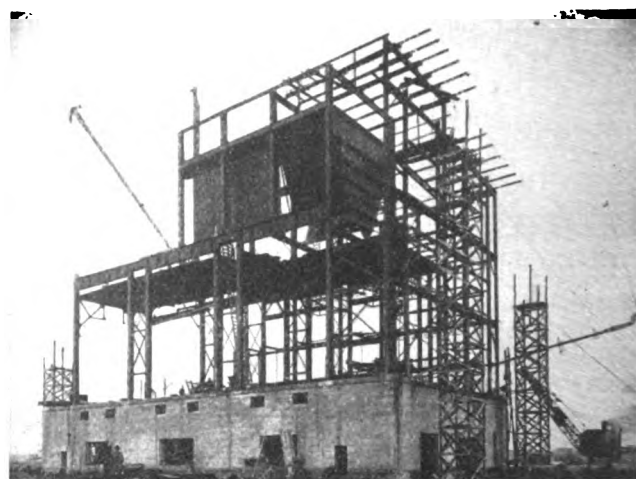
JIB AND MAST ELEVATED ON STEELWORK.
